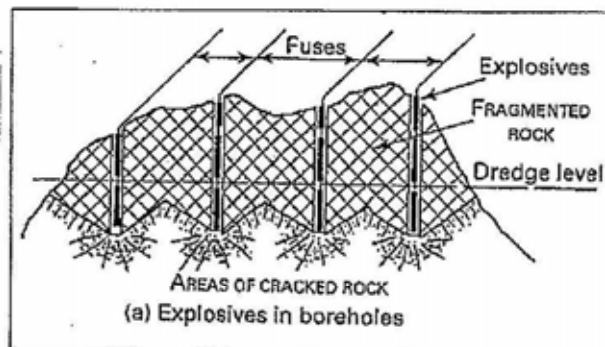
Cross-section of Seabed to be blasted (Arrangement of Explosive Holes)
